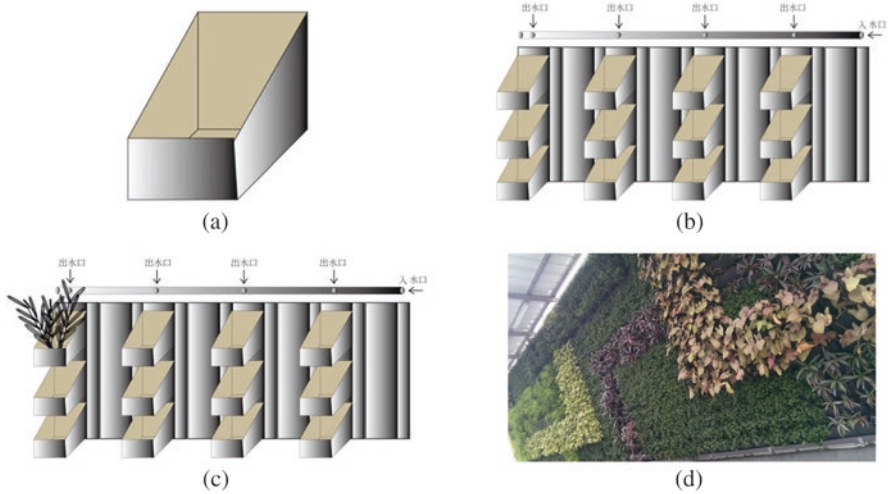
Components and example of a traditional vertical green wall. (a) A regular outdoor wall hanging planter. (b) A cluster of outdoor wall hanging planters. (c) Irrigation system formed from the planting method. (d) A construction project on the Zhongxiao E. Road in Taipei City
